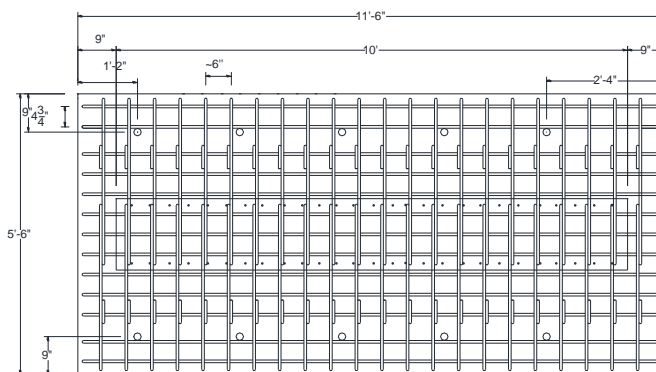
Section D-D in design drawings for Specimen 9 (see Figure 6.6 for the location of the section)
